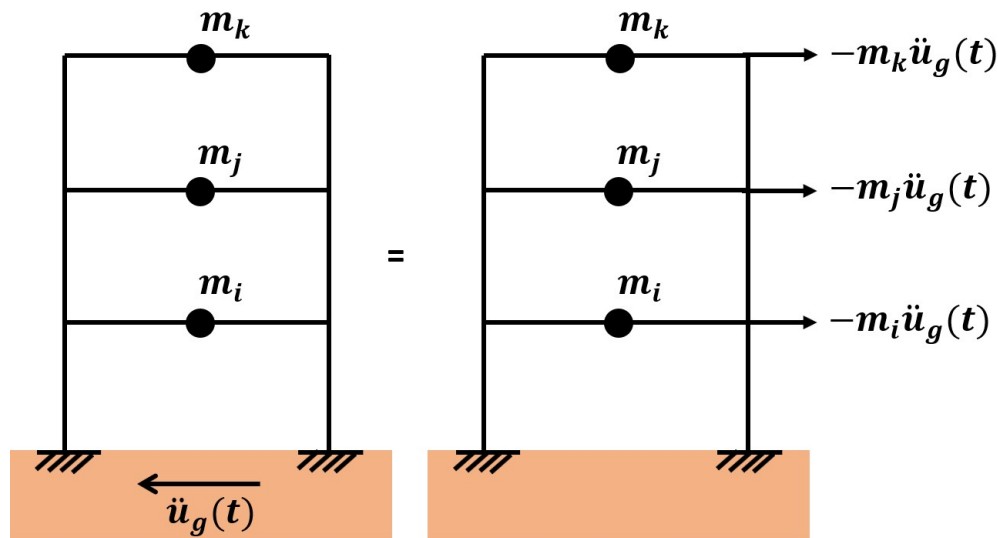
Schematic diagram for the force distribution of a building located in a non-shear-banding zone under the action of ground acceleration.
